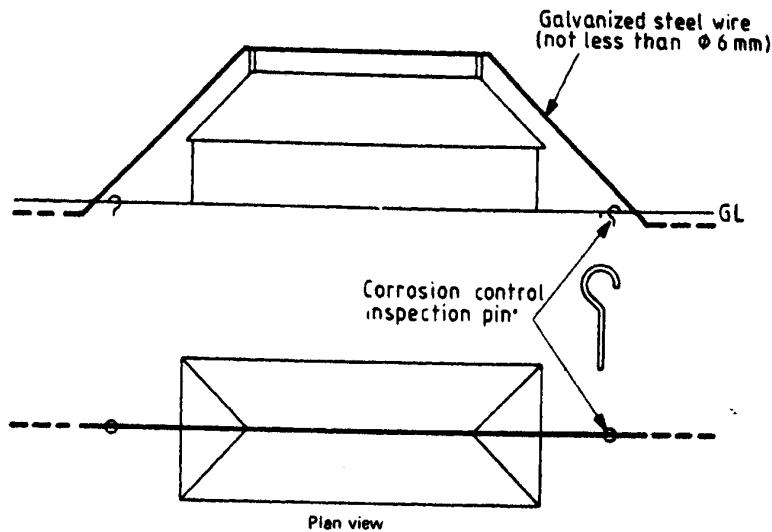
LIGHTNING PROTECTION (LOW COST INSTALLATION) FOR ISOLATED FARM BUILDINGS OF BRICK AND TILE CONSTRUCTION
